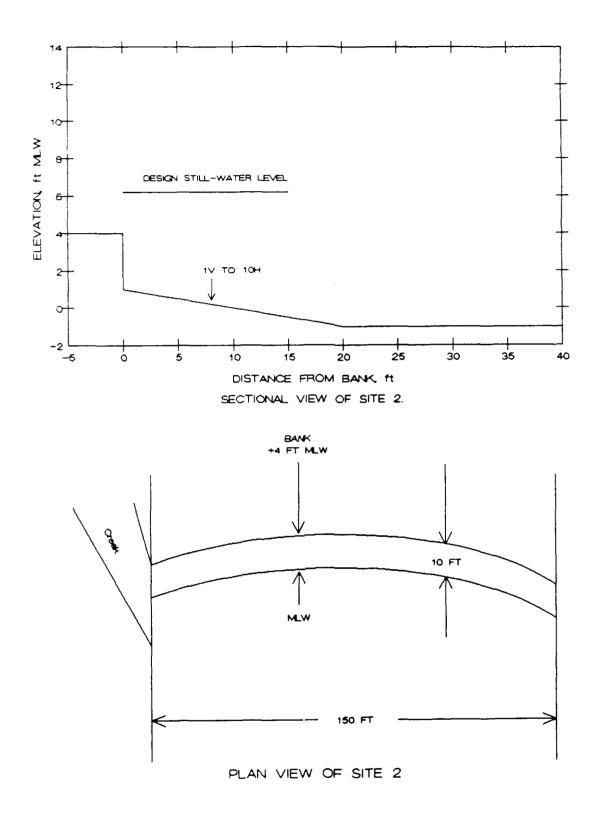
SECTIONAL AND PLAN VIEWS OF SITE 2
